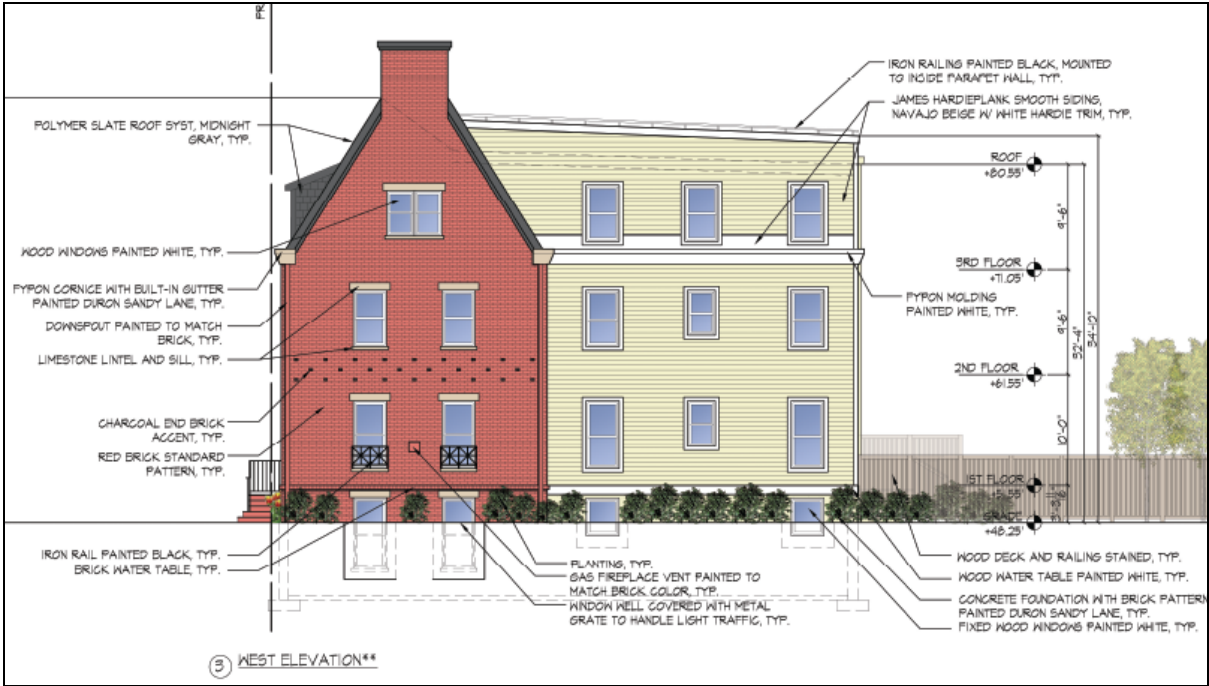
Proposed side (east and west) elevations at April 1, 2009 hearing.
